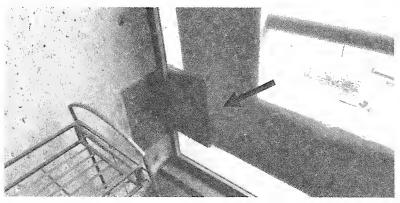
Concrete cracking next to anchor at balcony rail interior
